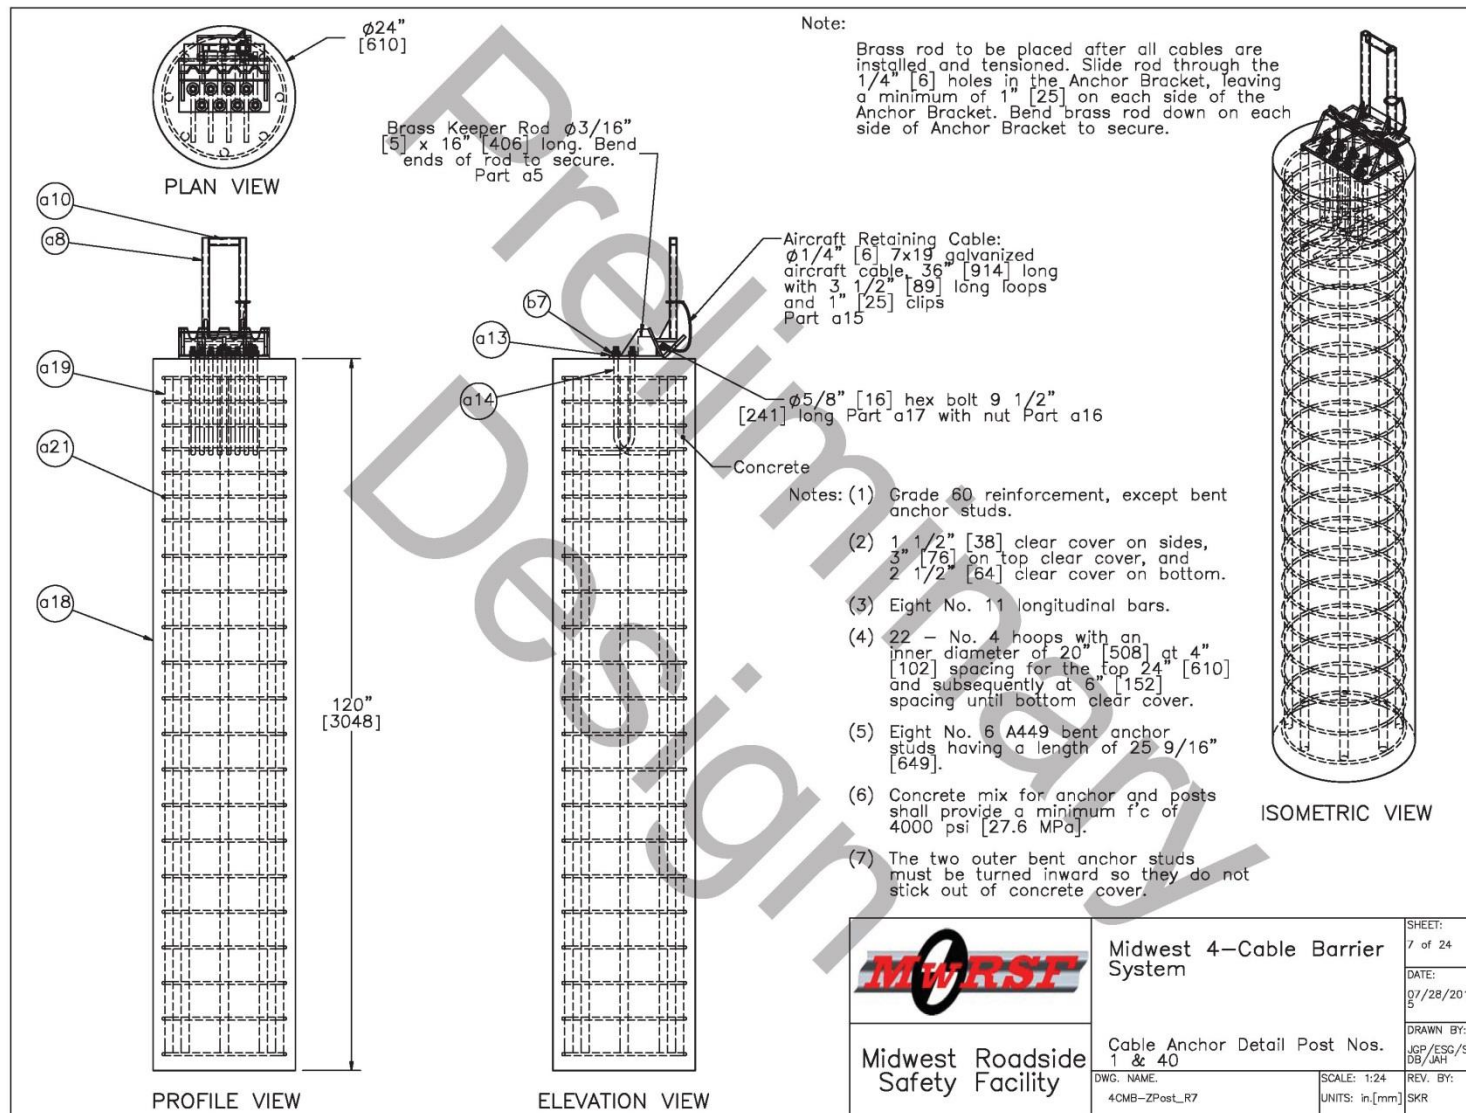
Cable Anchor Detail Post Nos. 1 and 40, Test No. MWP-1
